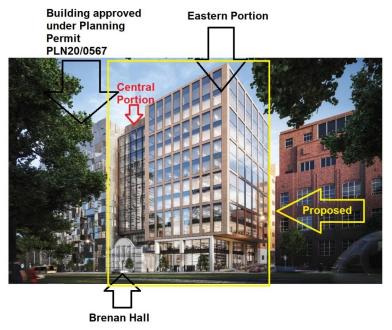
Proposed Victoria Parade elevation / render showing the building at the approved building at the Nicholson Street and Victoria Parade intersection.
